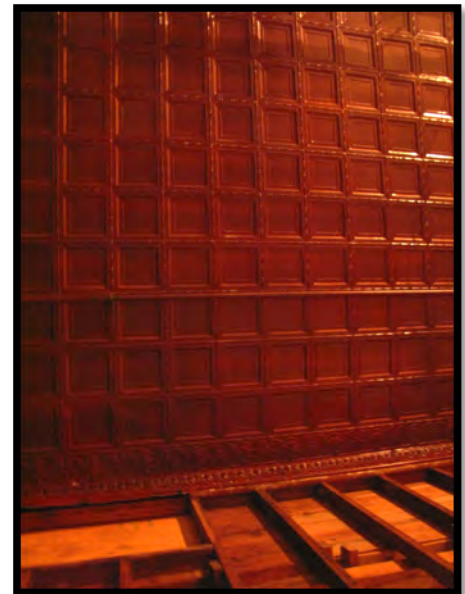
The second-floor, looking to the south wall, is completely unfinished and exposed.
